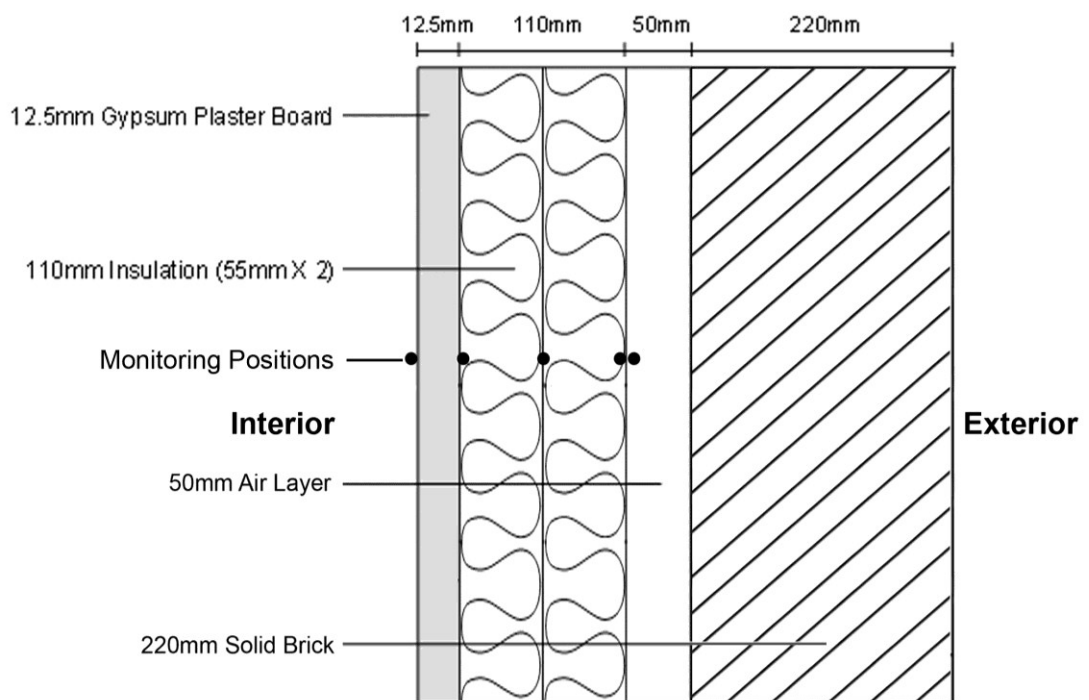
The vertical cross section of the solid brick wall assembly (with air gap) without vapour barrier (wall-5).
